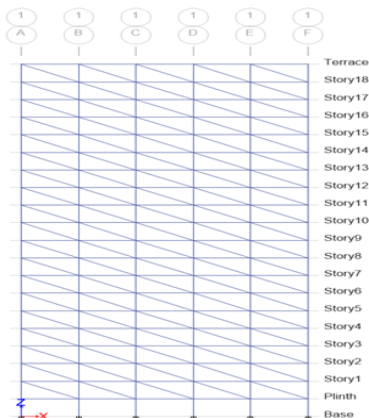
Structural Model (Elevation along X) With Infill Walls
